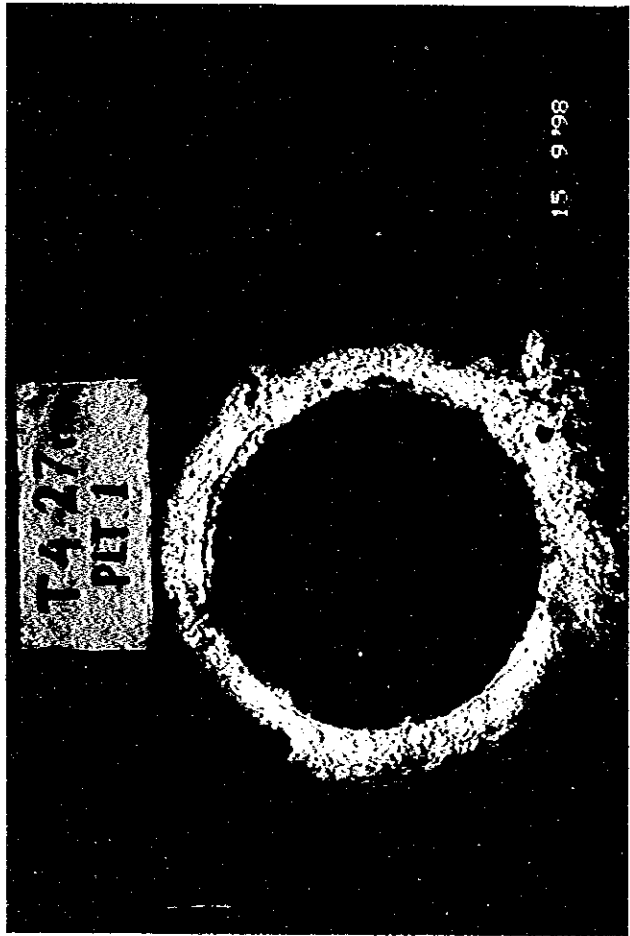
Tested Rock Surface Photograph for In-Situ Plate Loading
